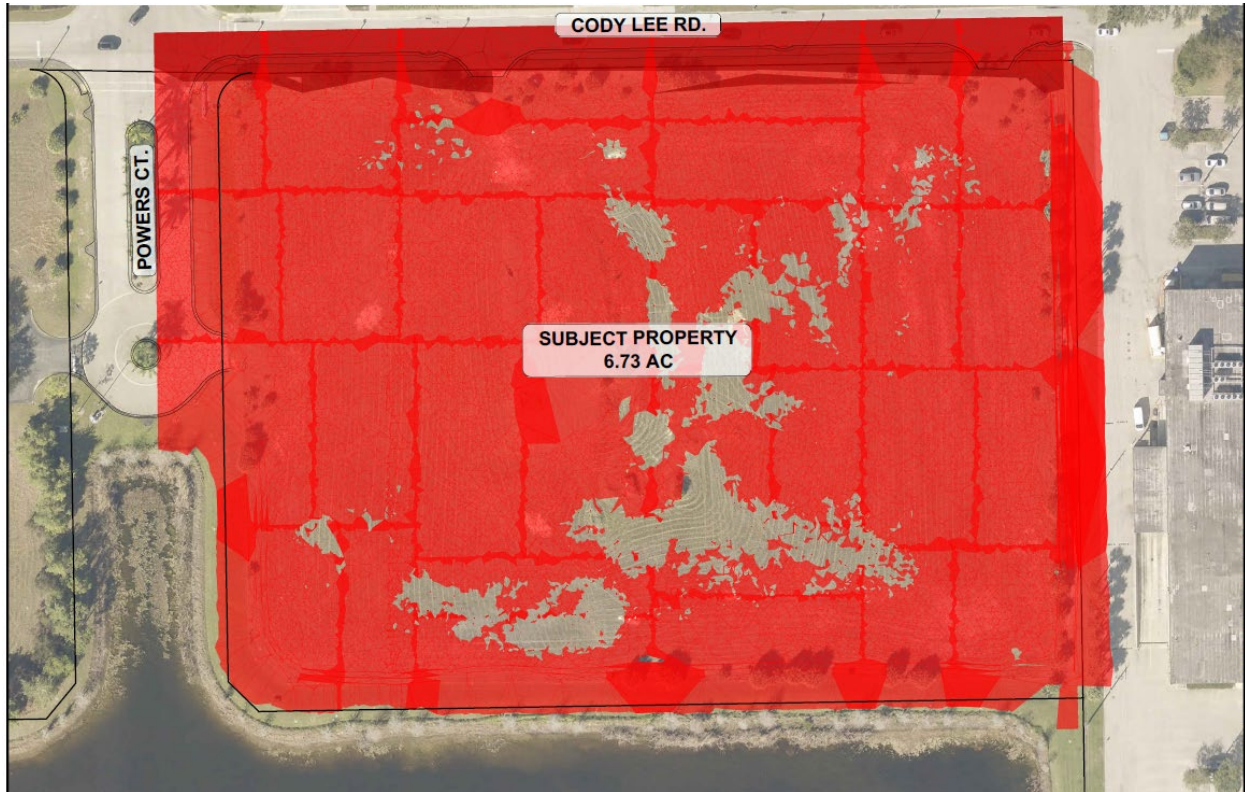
Areas on Southeast Parcel where Current Elevation Exceeds Control Elevation
